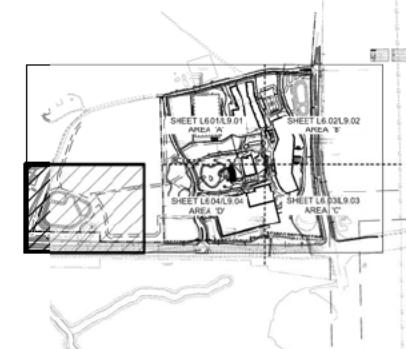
DETAILED LANDSCAPE PLAN AREA "E" SEE L6.05
